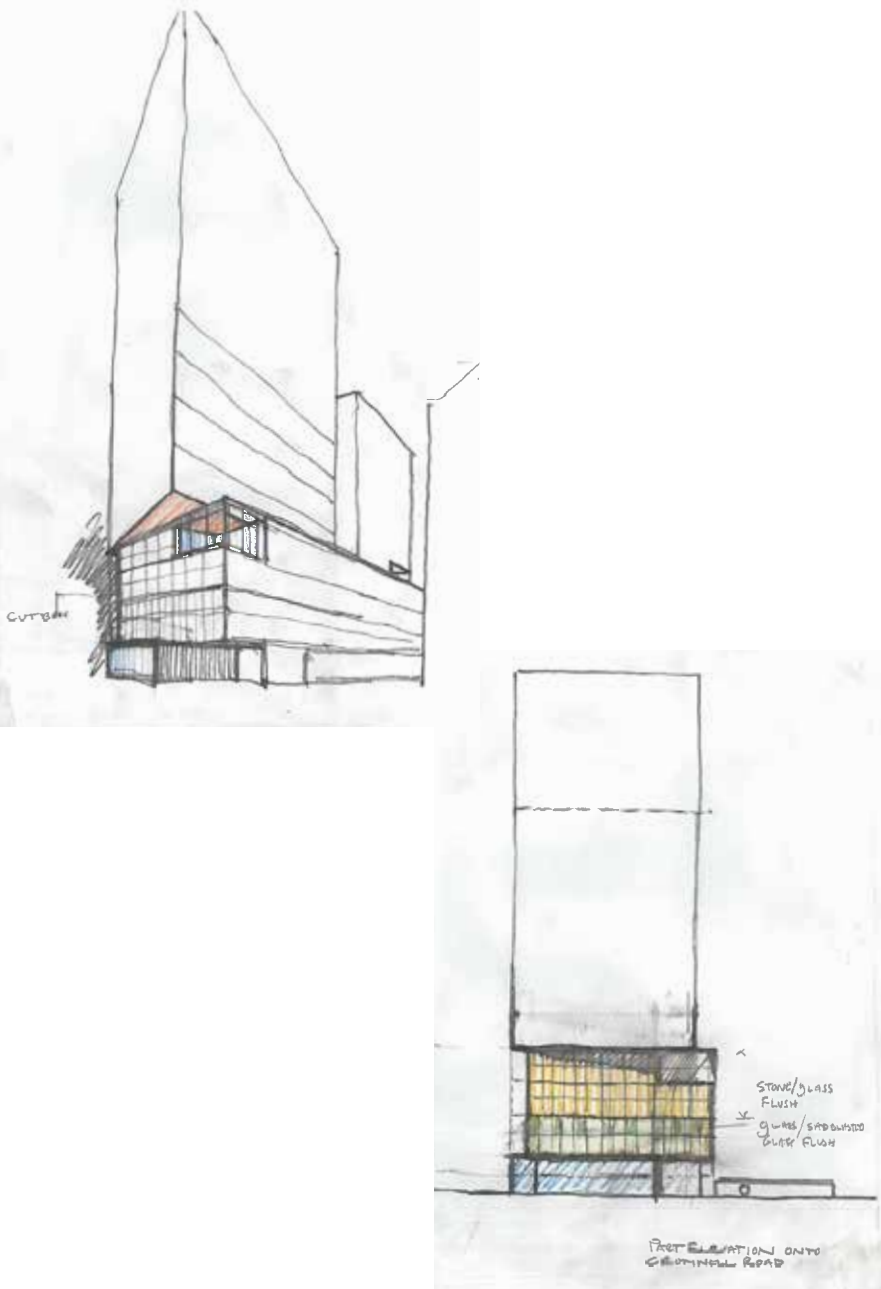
Conceptual sketches of the final formal amendment to the formal composition; to offset the towers from the podium and to reinforce this off set with cut-outs and cantilevers
